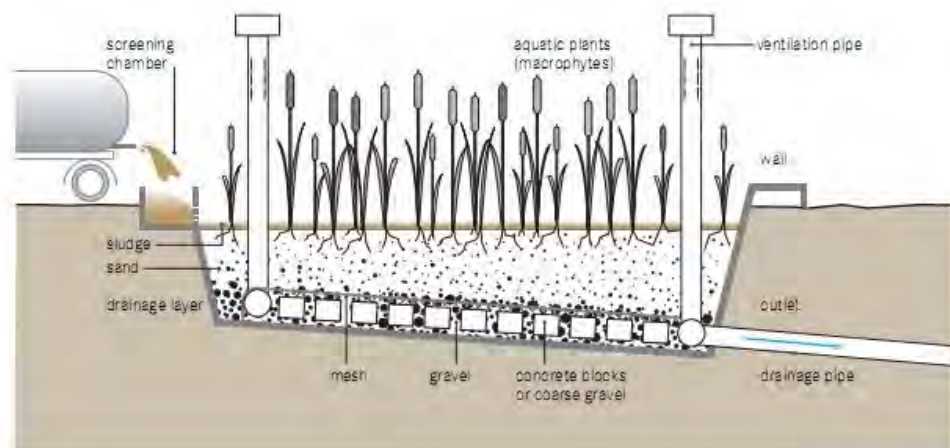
Planted sludge drying bed (Tilley et al. 2008)
